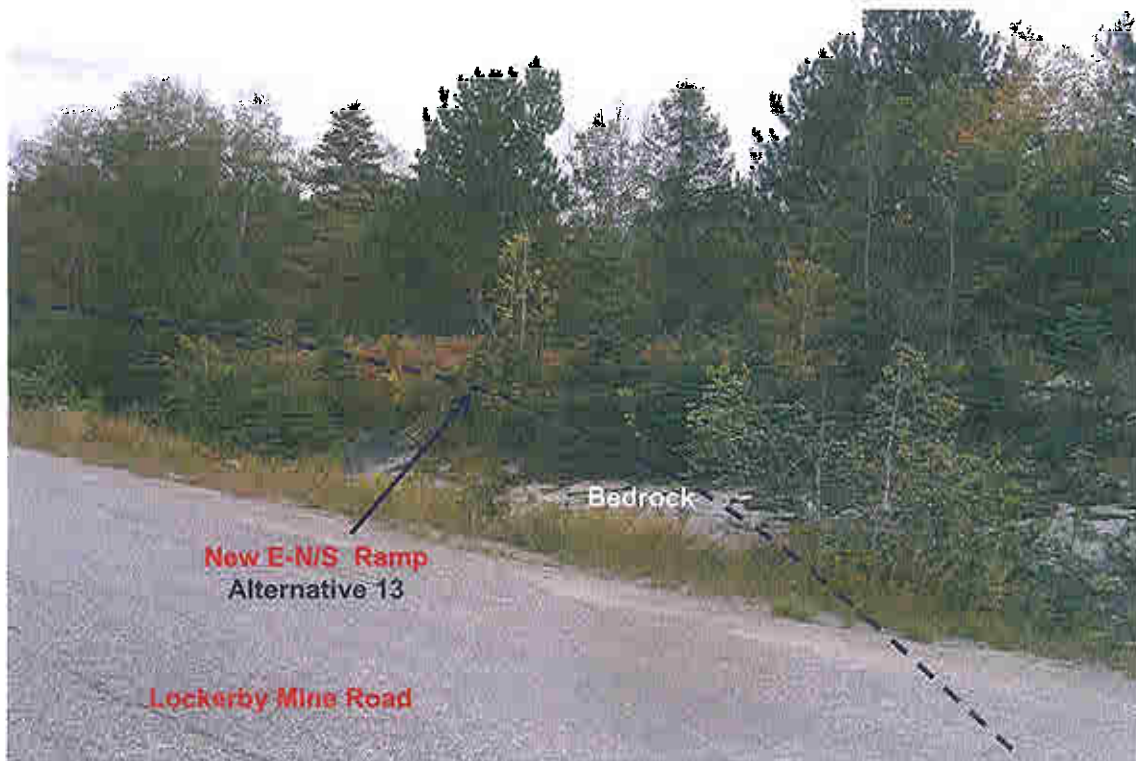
VIEW: Looking east from west side of SMR 3 about 100 m north of Lockerby Mine Road showing typical shallow bedrock terrain conditions. (September 12, 2006)
